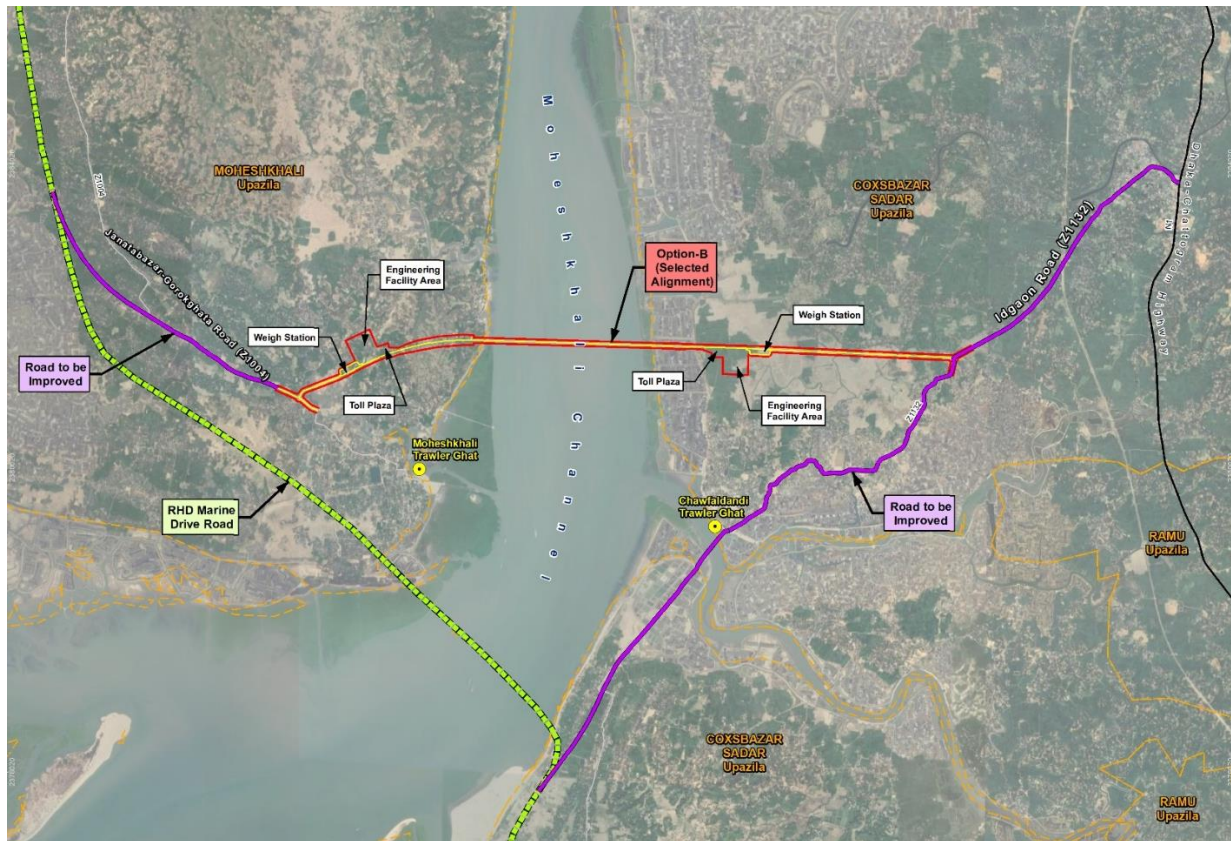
Proposed roads improvement to connect Alignment B with the MDP.
